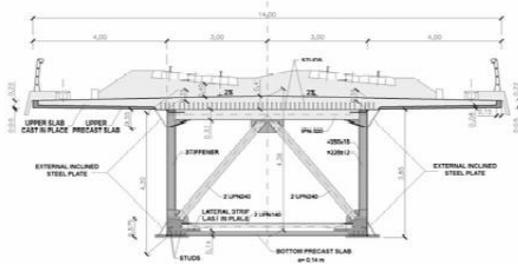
Cross-section of Arroyo de las Piedras viaduct [4]
